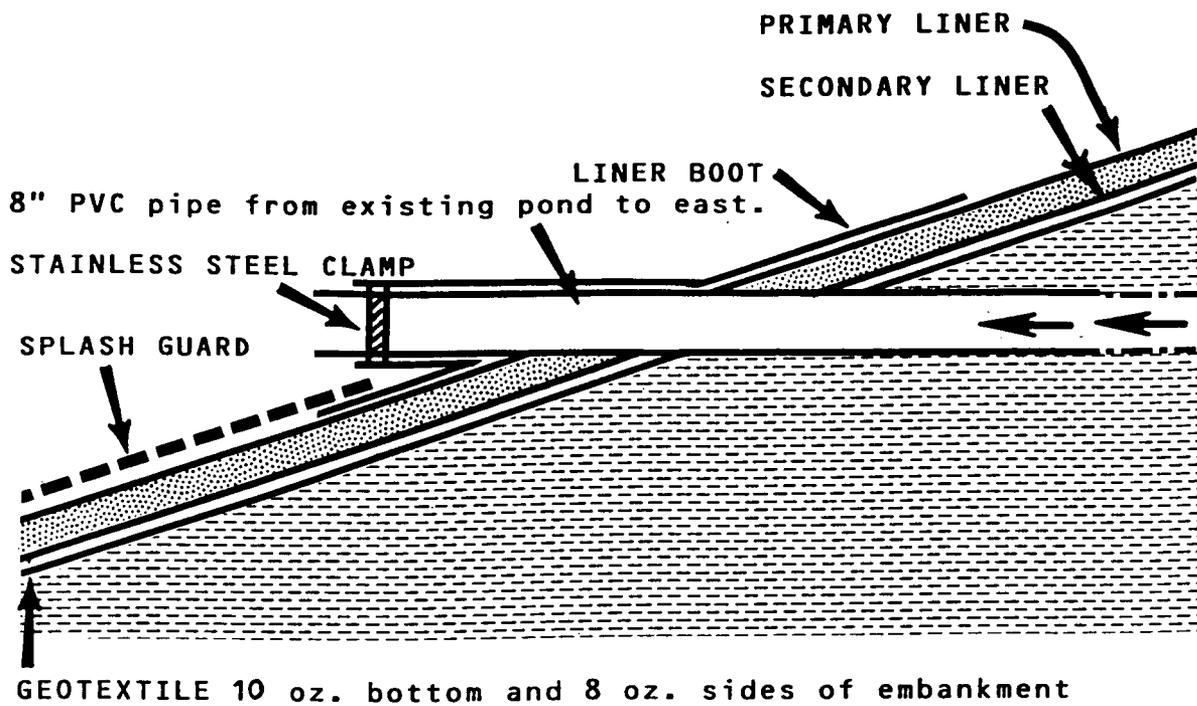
Cross-section of liner boot placement, if needed for discharge pipe or air vent placement.
